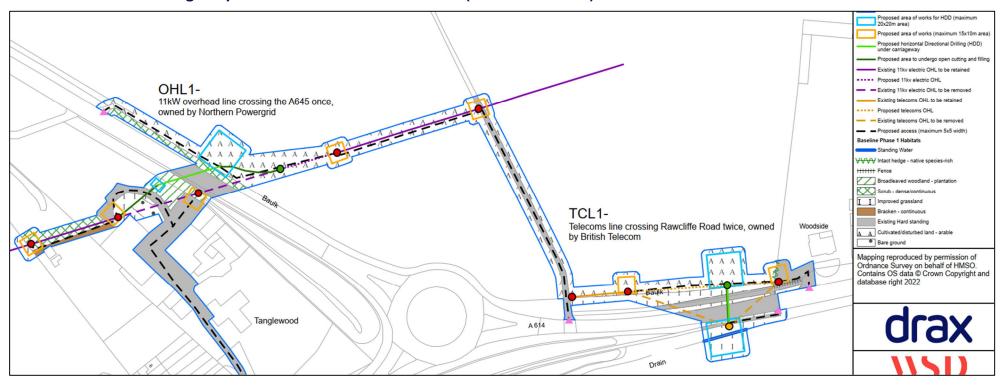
Plan showing Proposed Areas of Works for HDD (OHL1 and TCL1)
